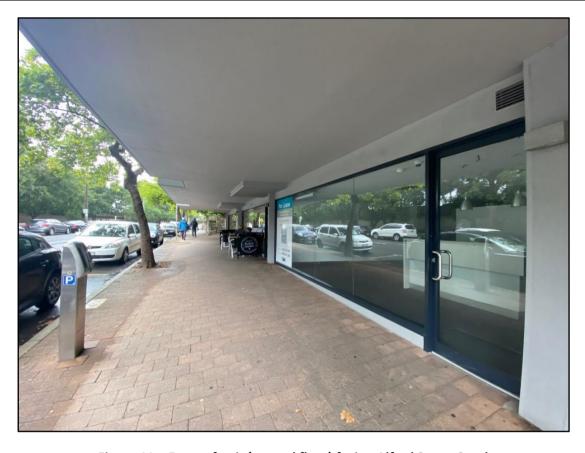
Front of unit (ground floor) facing Alfred Street South
